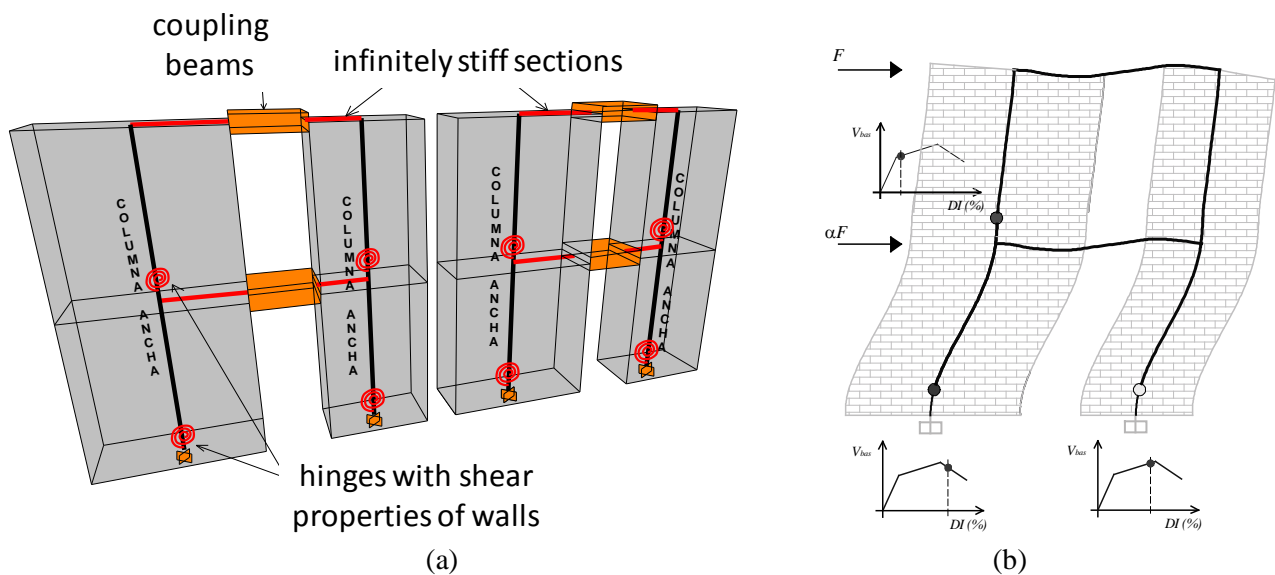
Modified wide-column model for Specimen 3D: a) Nonlinear model, and b) Damage assessment
